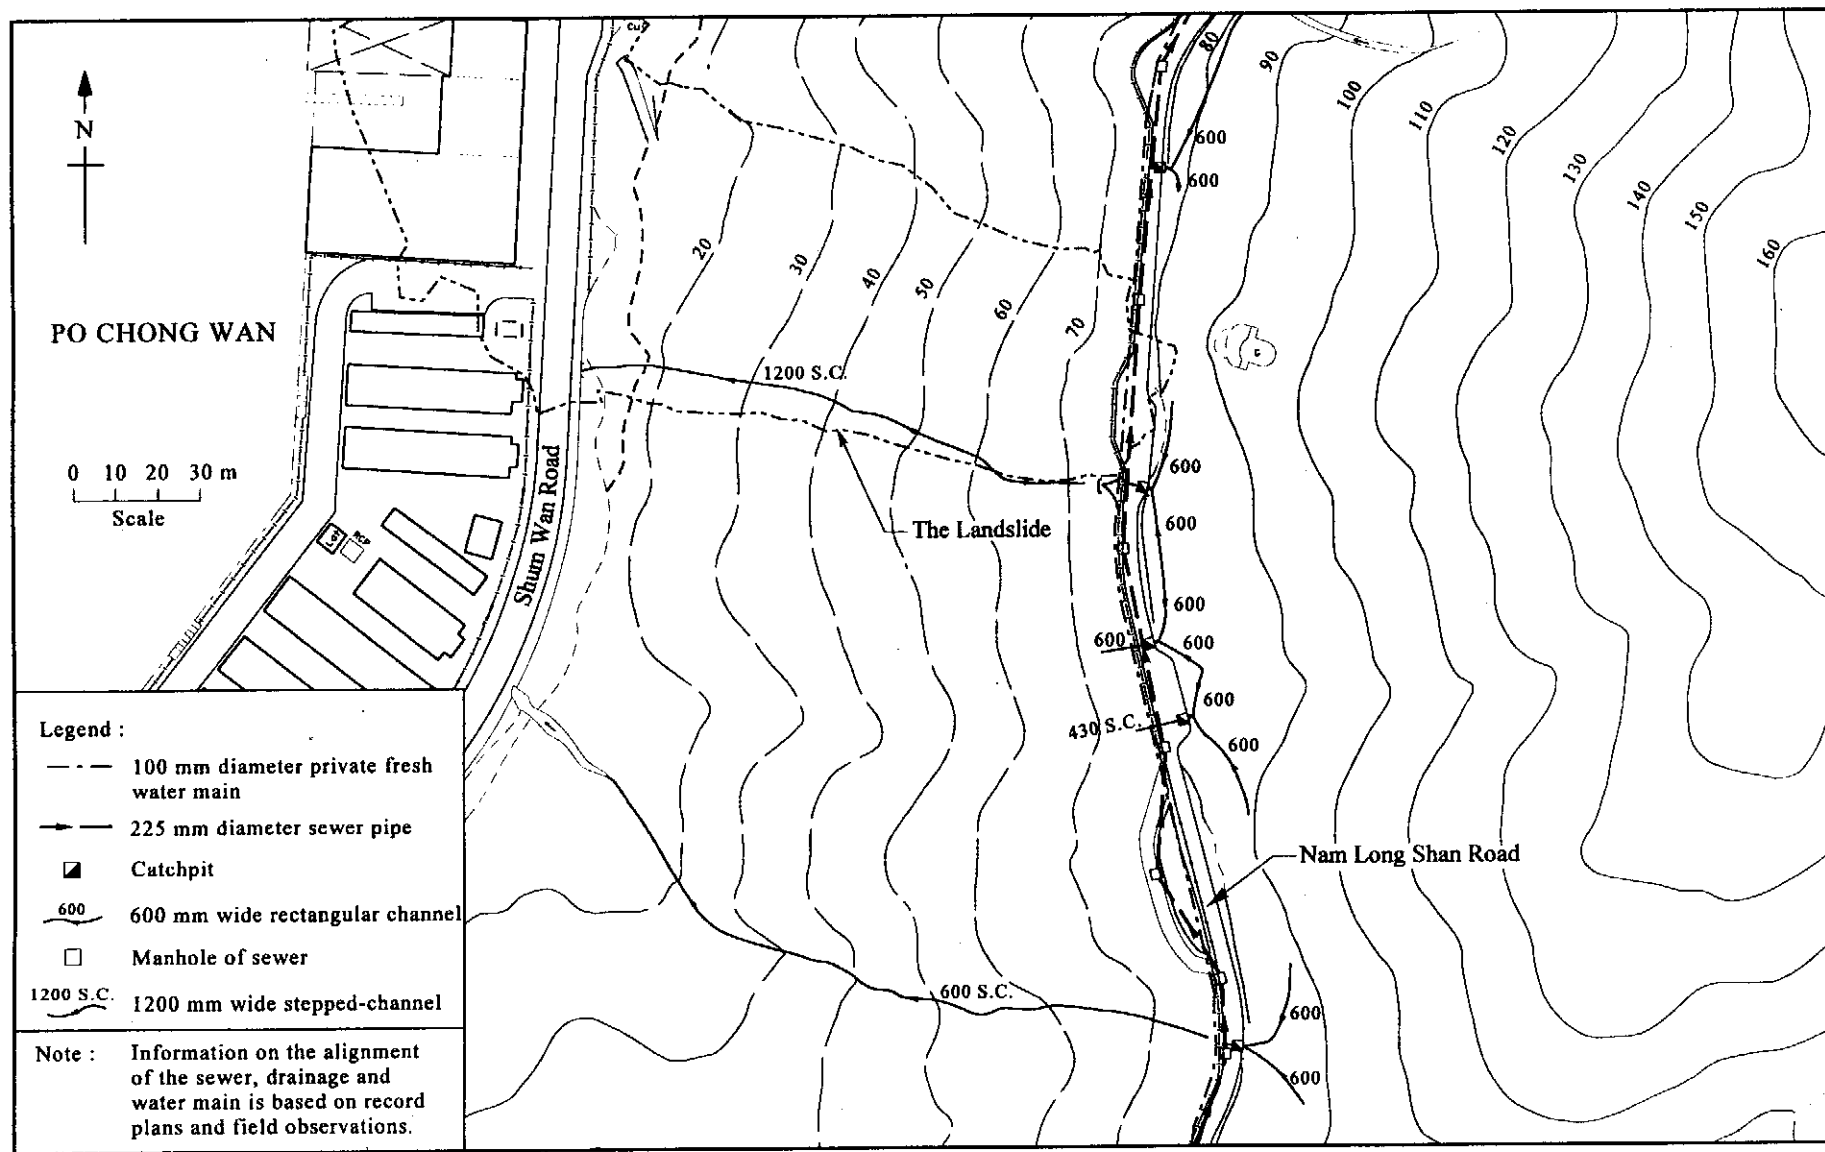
Layout of Drainage and Water-carrying Services at Nam Long Shan Road
